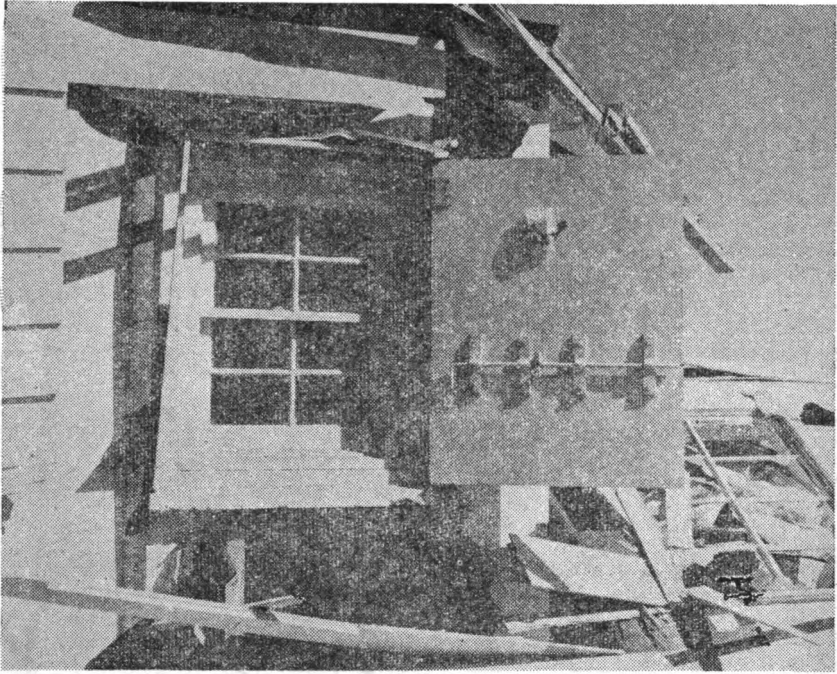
Reinforced-concrete bathroom shelter with blast-resistant door and window shutters opened, after the shot.
